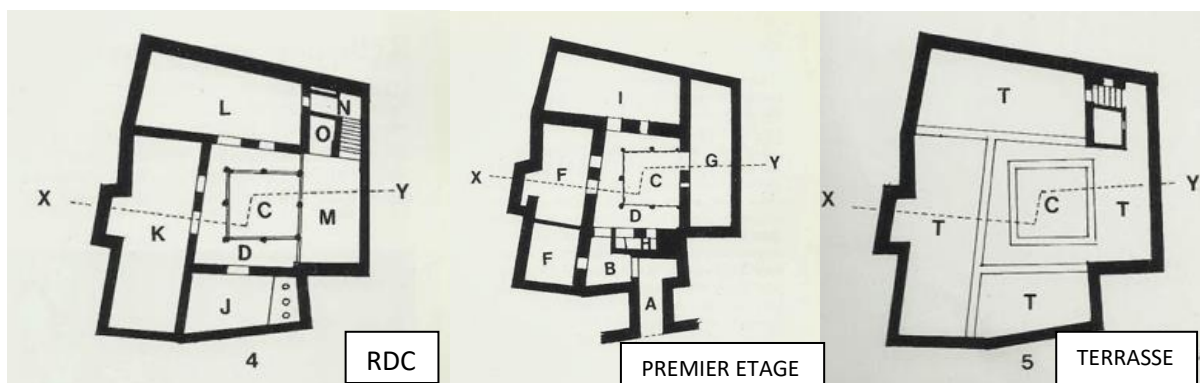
Ground floor plan, first floor and terrace casbah of Algiers. Source: the casbah the site created the city Andrea Ravereau.pp77.
